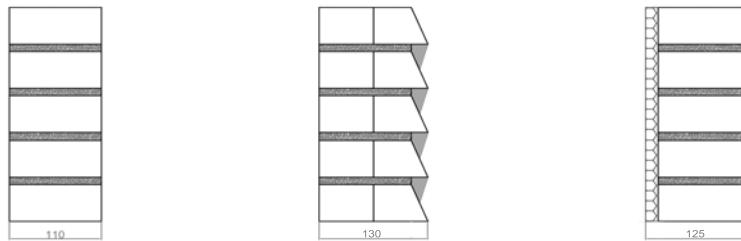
Conventional brick, self-shading brick and conventional brick with insulation wall sections.
